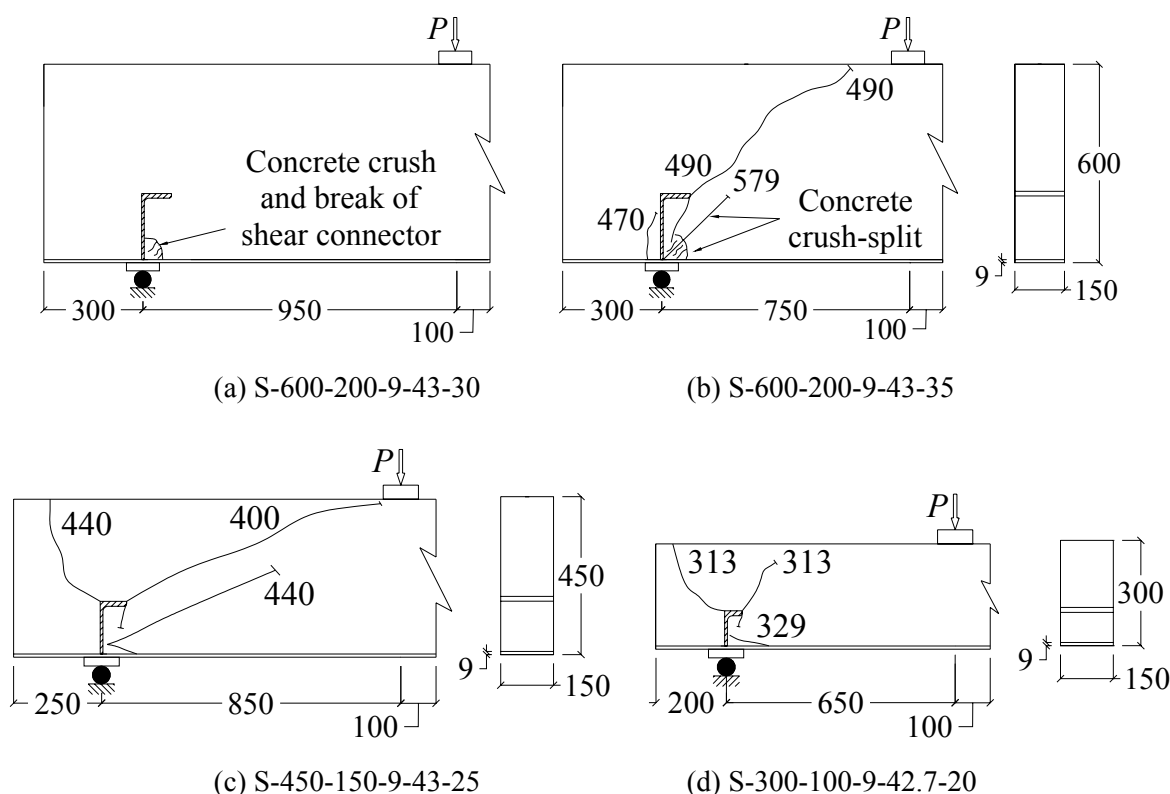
6 Crack patterns of specimens failed in concrete crush and shear failure mode.
